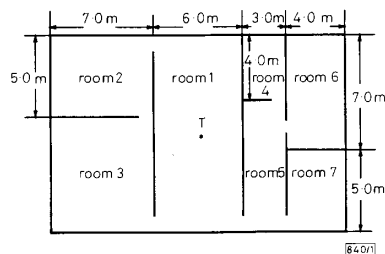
Floor plan of one part of Atwater Kent Laboratories
